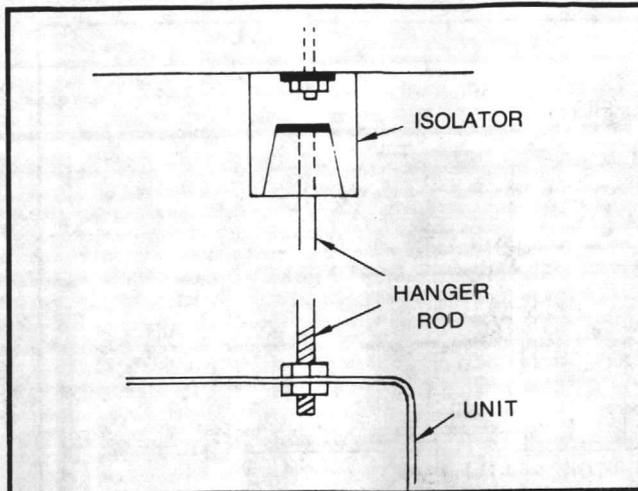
Ceiling-Mounted Unit Hanger Rod Detail
